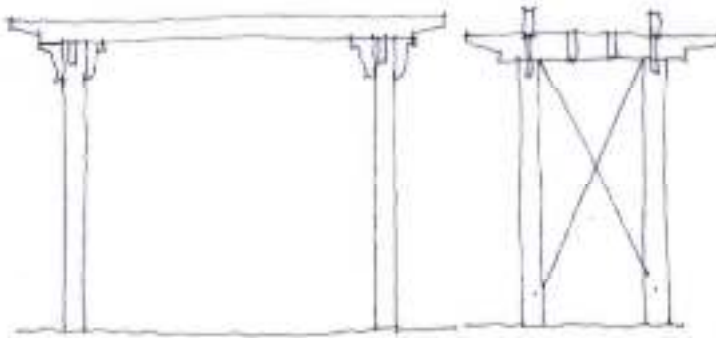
Garden structures should be timber and interpretations of traditional details for providing shade and amenity.
